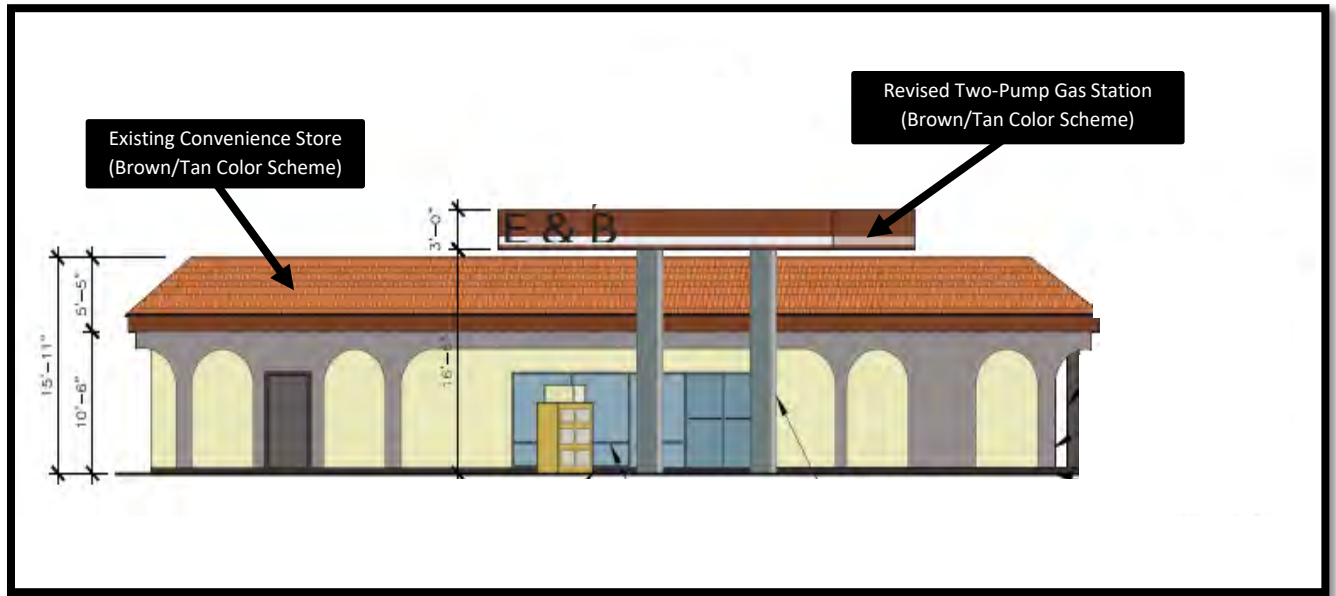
Project Looking South from La Cresta Road (Revised Color Scheme to Match Existing)
